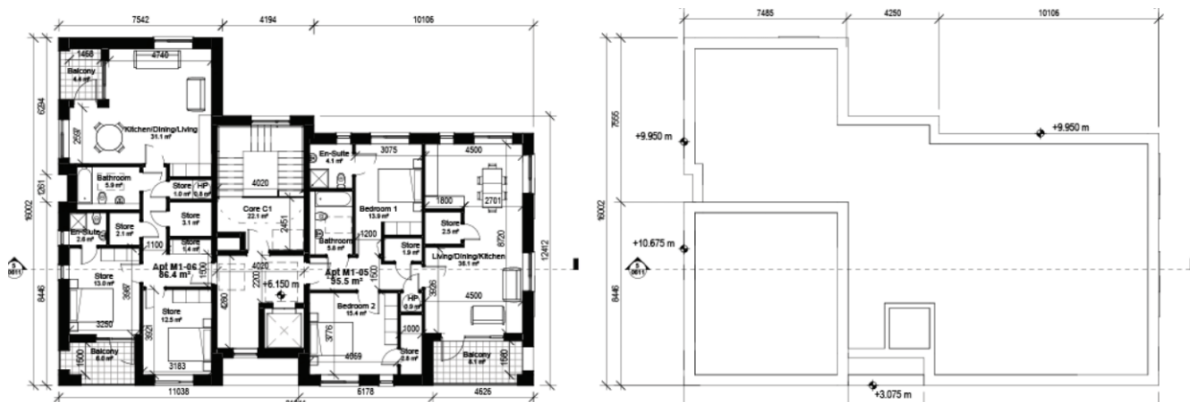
Proposed second and roof floor plans of Apartment Block M
